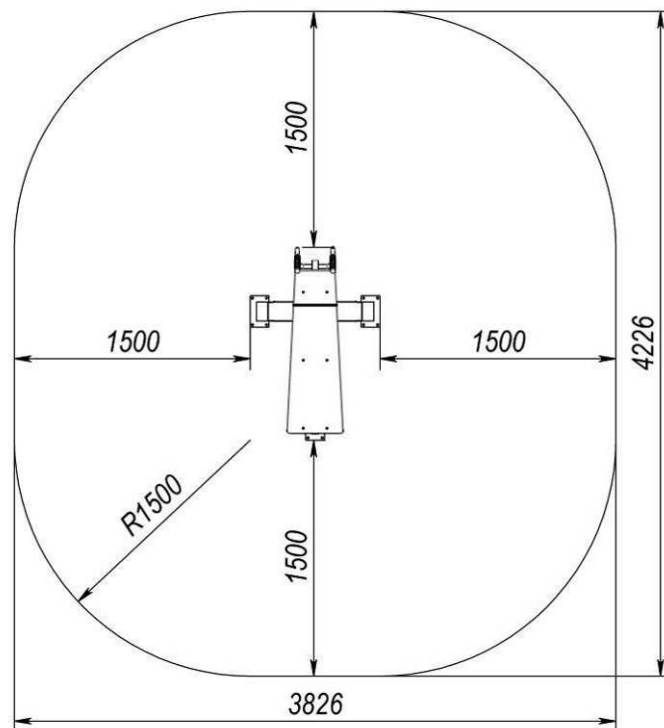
Assembly scheme (Identical assembly scheme KF816.1-1)
